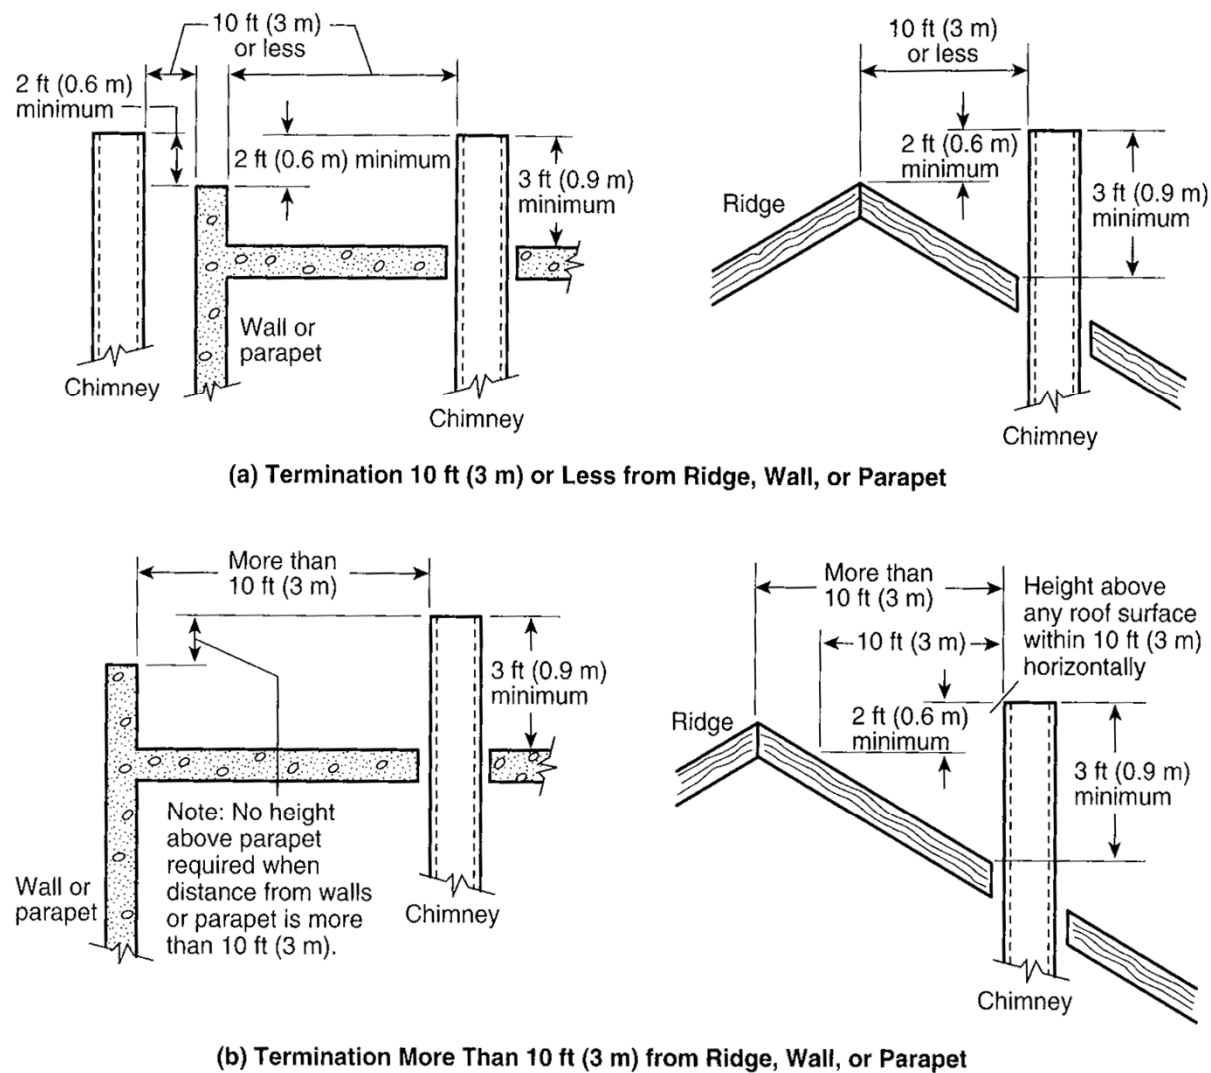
Typical Termination Locations for Chimneys and Single-Wall Metal Pipes Serving Residential-Type and Low-Heat Appliances.
